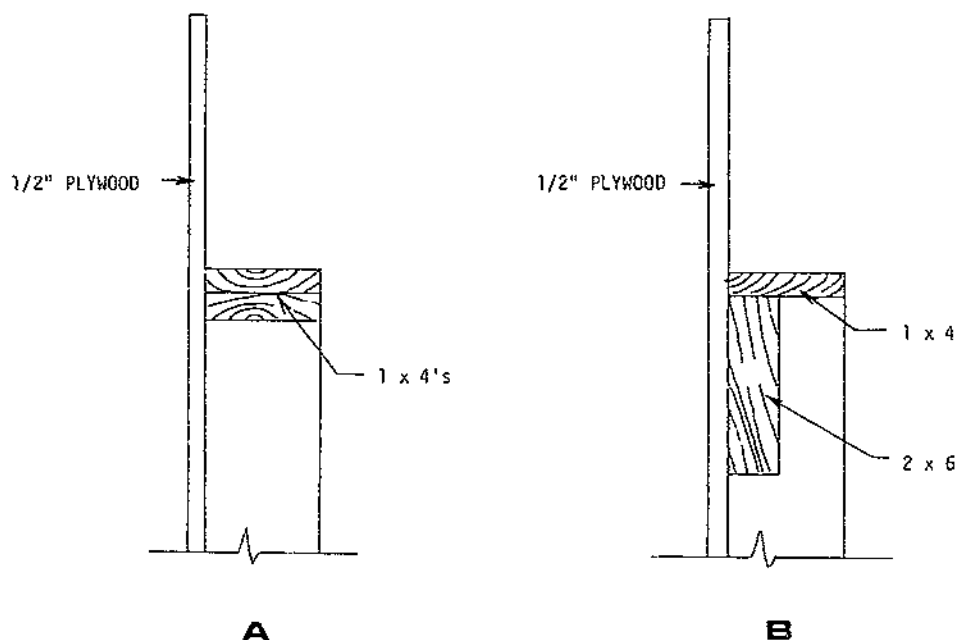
Increasing load-carrying ability by notching 2-inch framing member into studs. *A*, Original foundation panel. *B*, Foundation panel with 2- by 6-inch beam.
